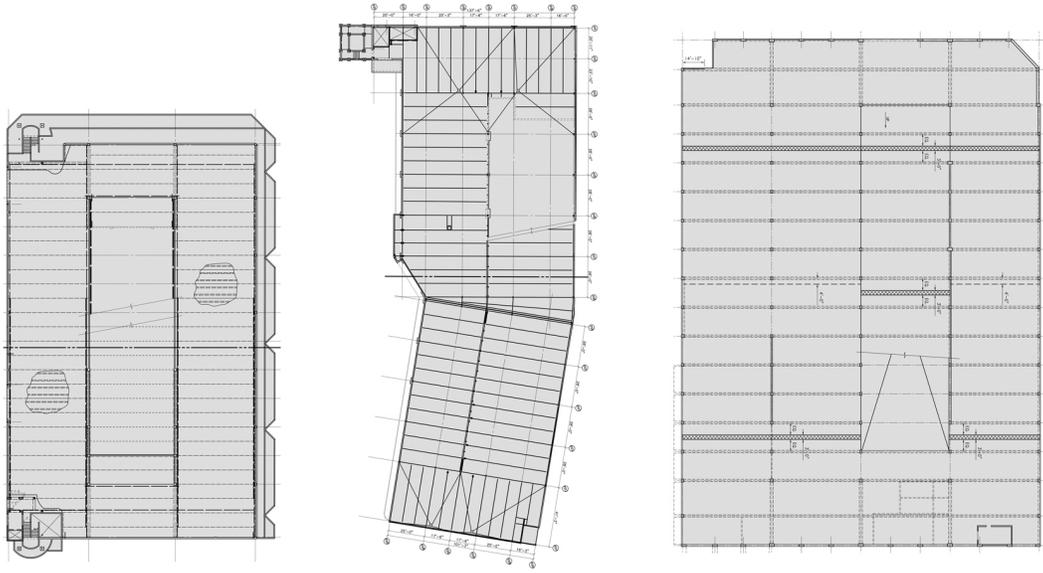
Plans at the same scale of the three case study parking garages (left to right): precast concrete, cellular steel and post-tensioned concrete.
